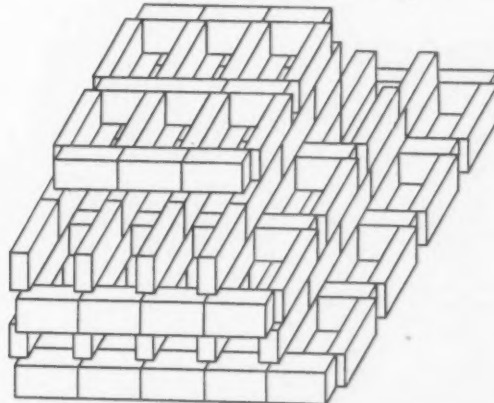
Checker arrangement featuring alternate chimney and open flue assembly.
